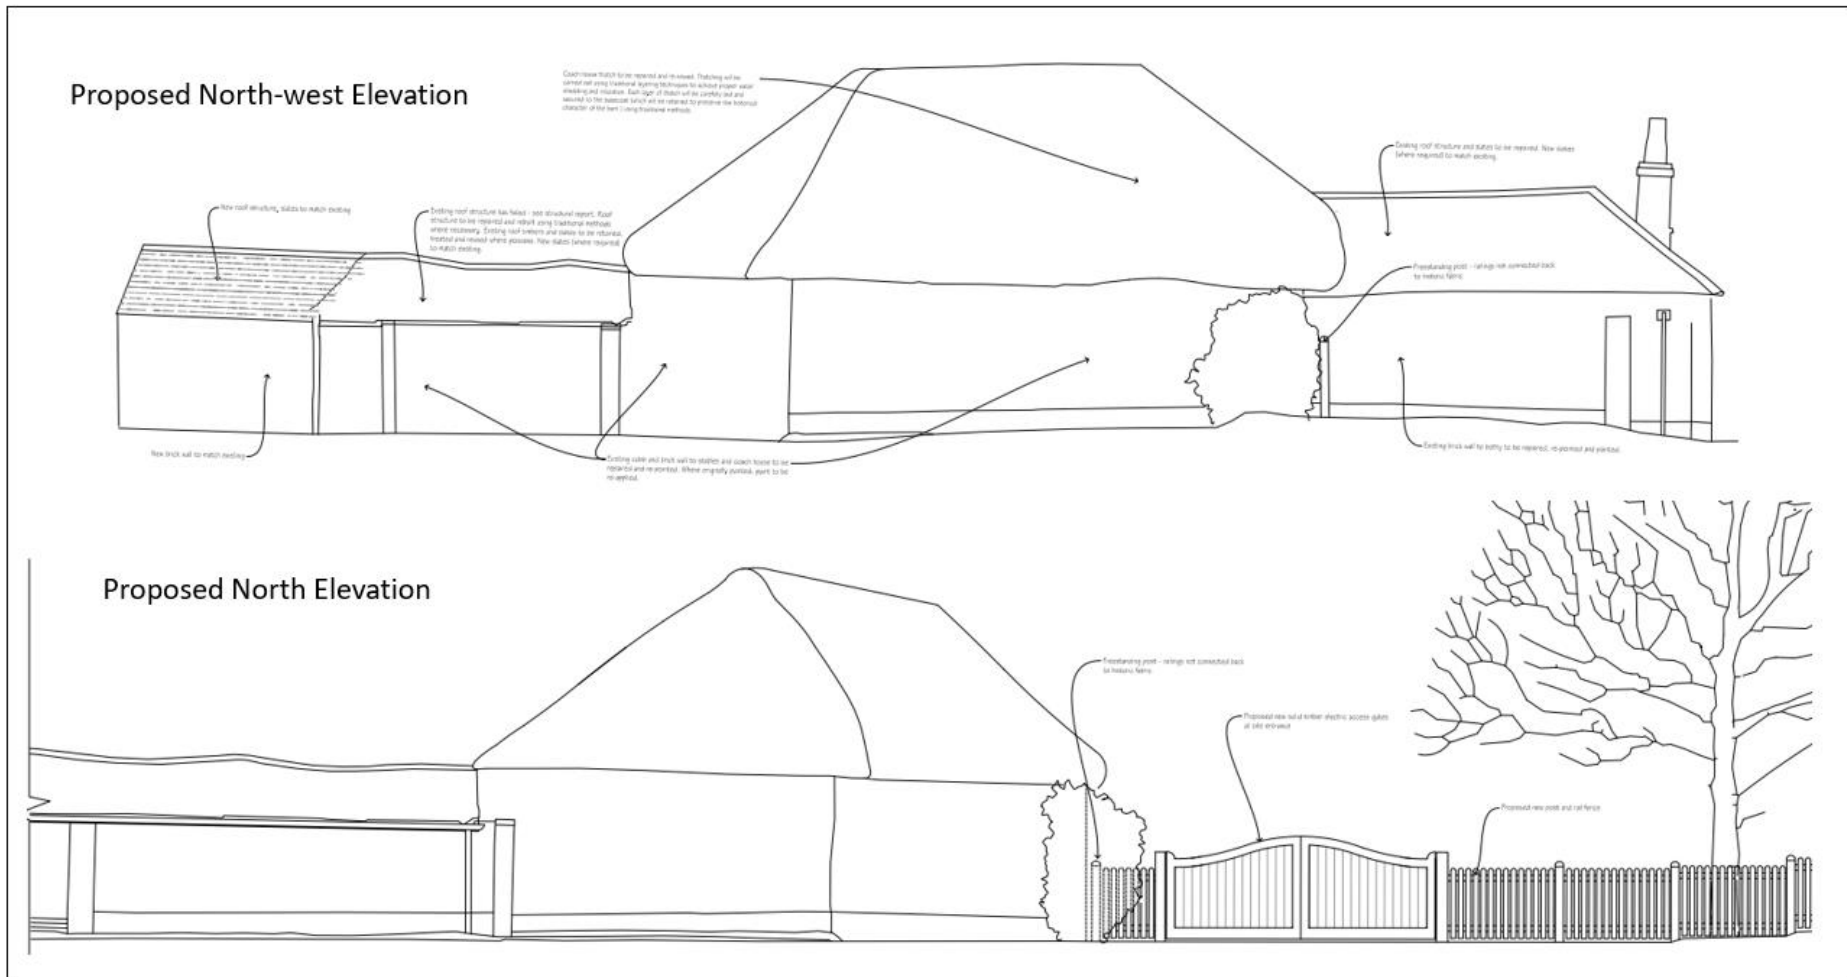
Proposed North-west and North elevations of the converted outbuildings at Bec House (Fowler Architecture and Planning).
